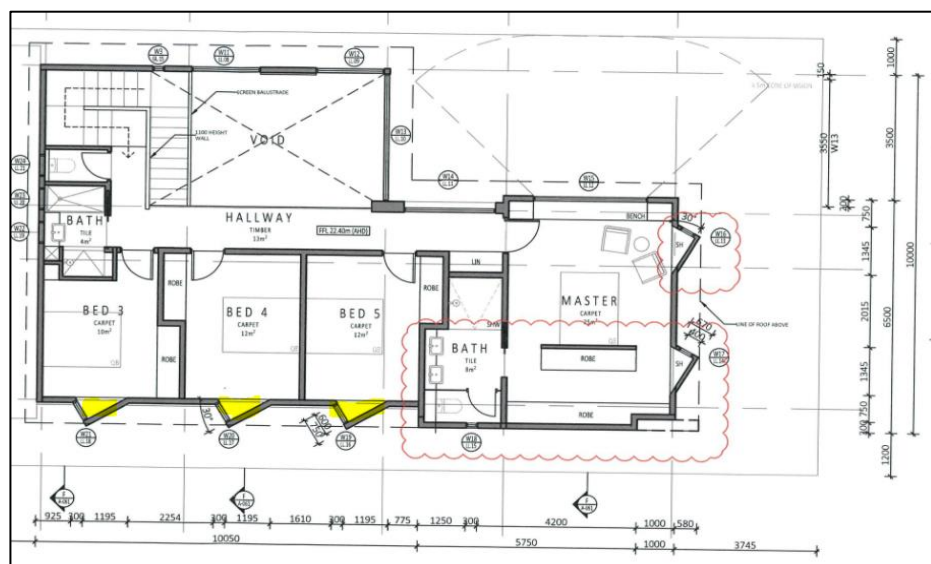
Minor Incursions of Bedrooms 3-5 Wall Height and Length First Floor
